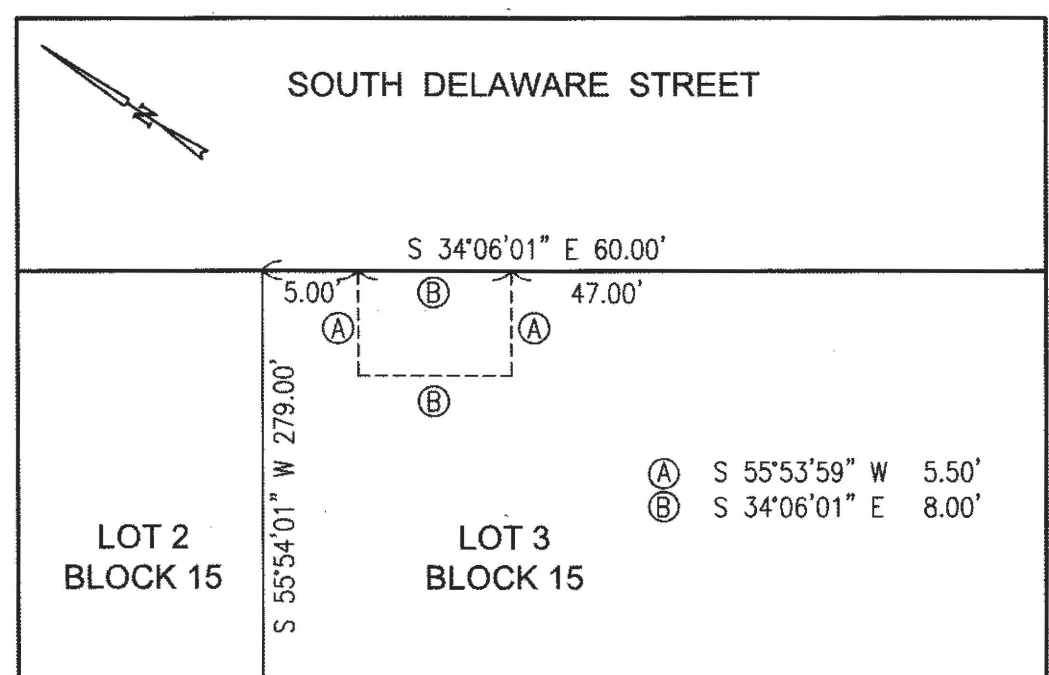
DETAIL 'D' - RIGHT-OF-WAY RESERVATION
